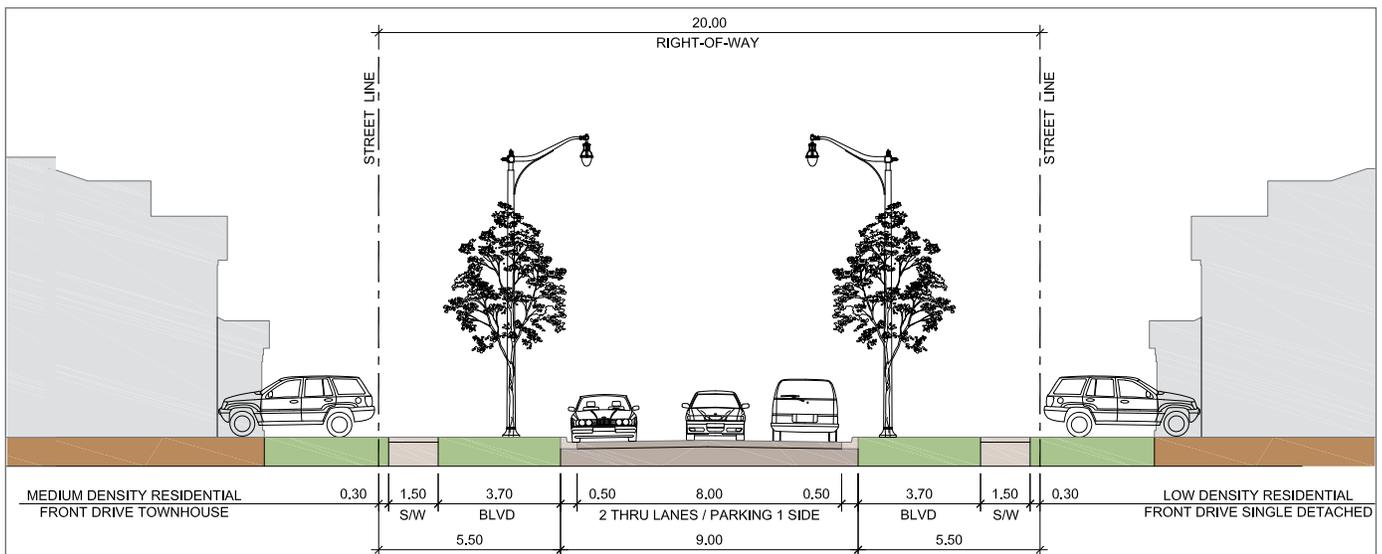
Local Road with Parking - 20.0m R.O.W. Cross-section
